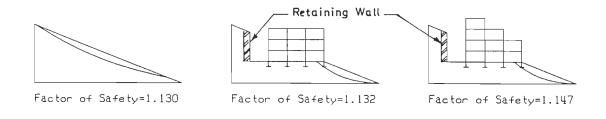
Sliding Failure Surface of Slope Under (Static+Seismic) Loads
